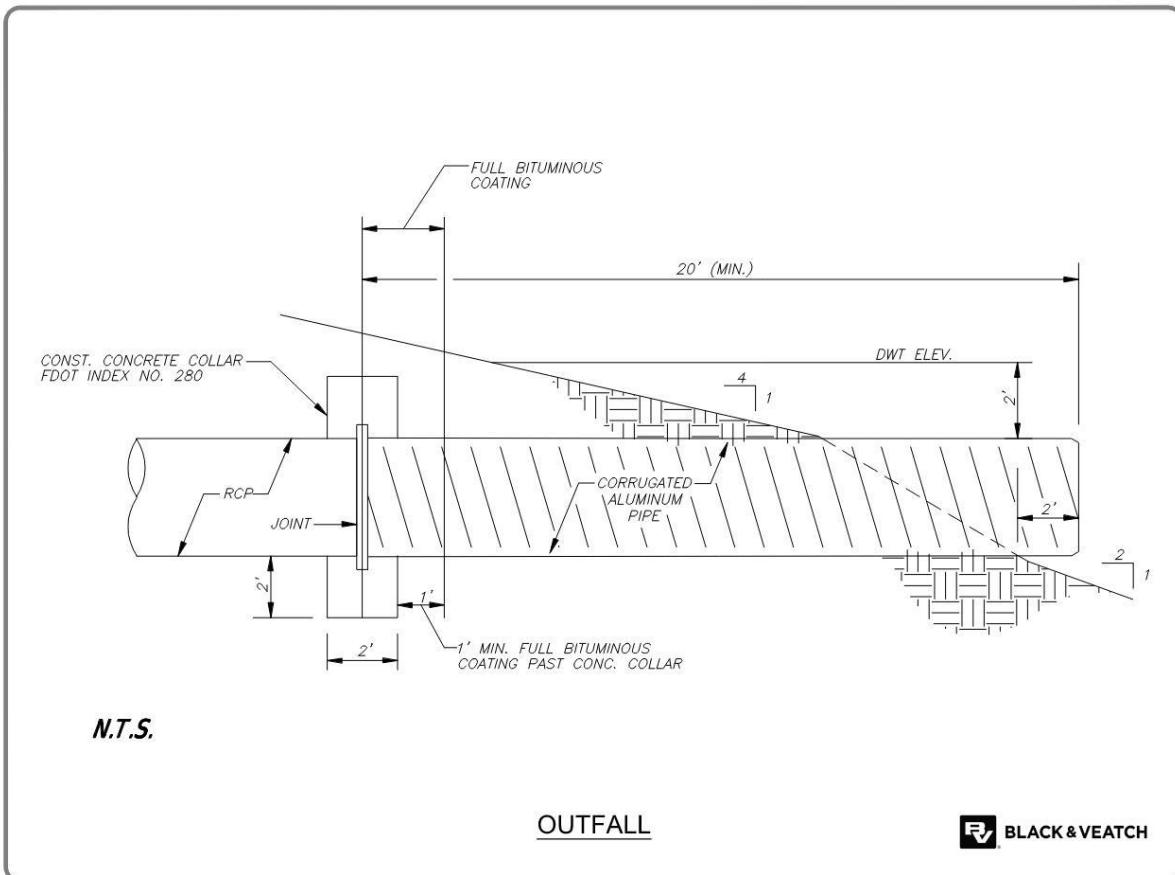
Standard Detail Depicting a Typical Outfall Design
